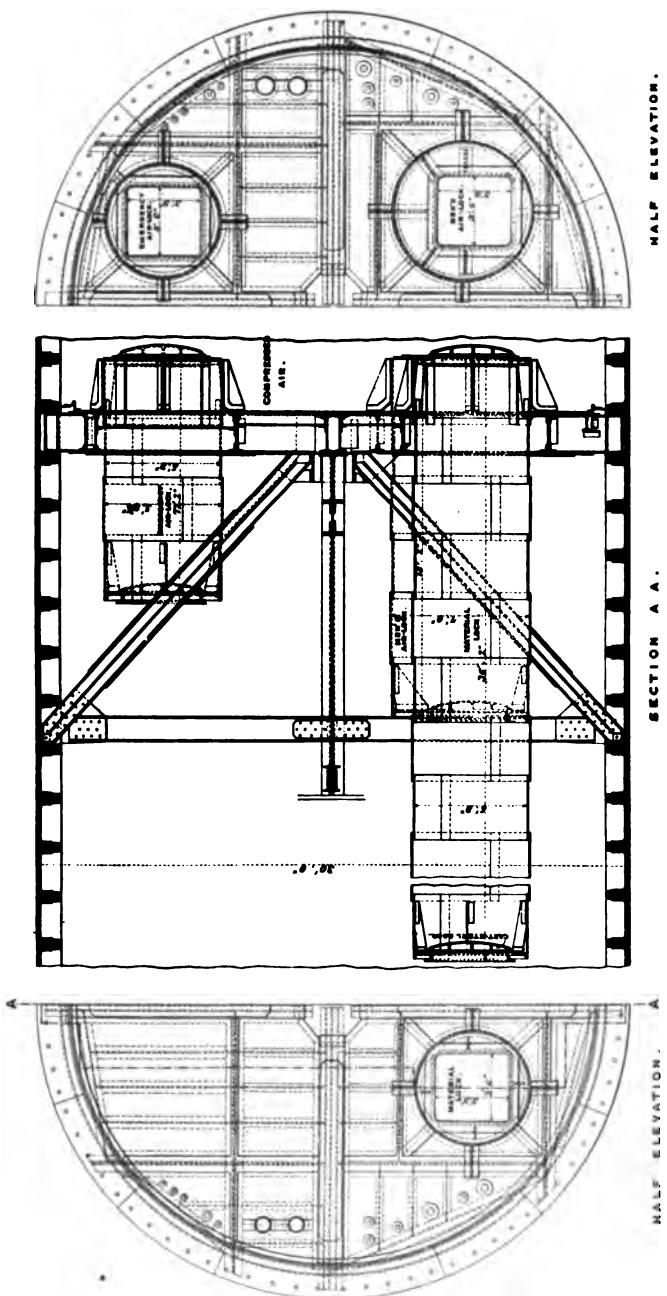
Structural steel bulkhead wall. Rotherhithe Tunnel (E-17). (From *Proc. Inst. C. E.*, vol. 175)
